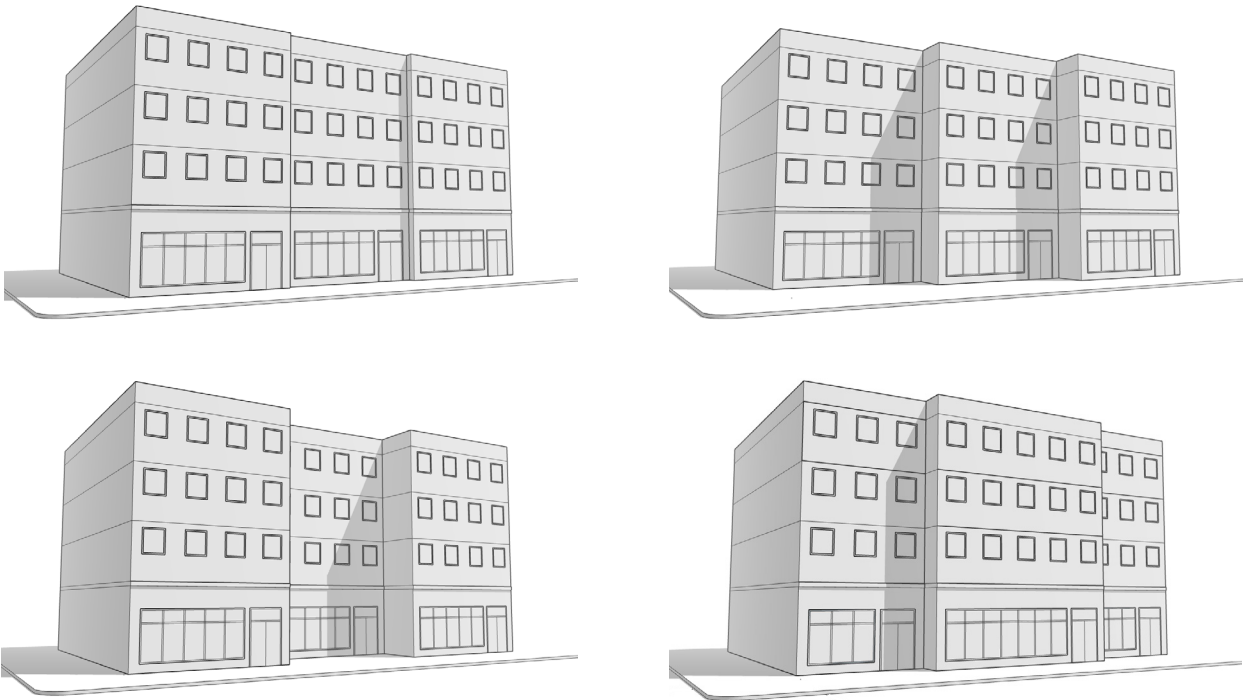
Possible ways to divide a horizontal mass into three elements (Section 4.1.4)
